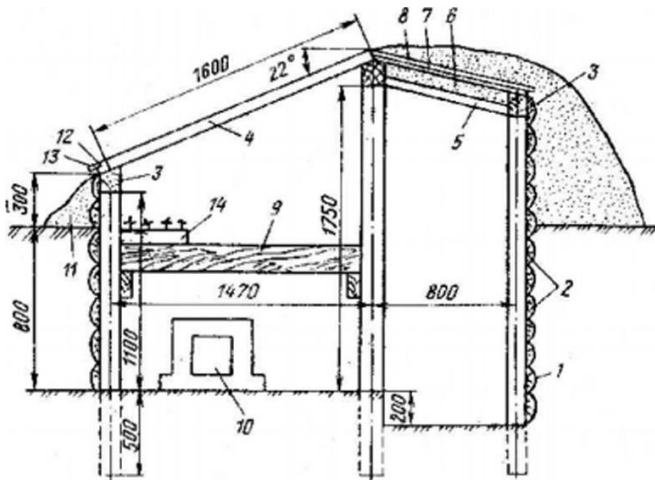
Winter lean-to greenhouse. 1-pillars; 2-cladding of the slab; 3-rail; 4-greenhouse frame; 5-facilities; 6-saw; 7-roofing; 8-earth backfilling; 9-rack; 10 duct; 11-slope; 12-resistant Board; 13-low tide; 14-a box of seedlings.
